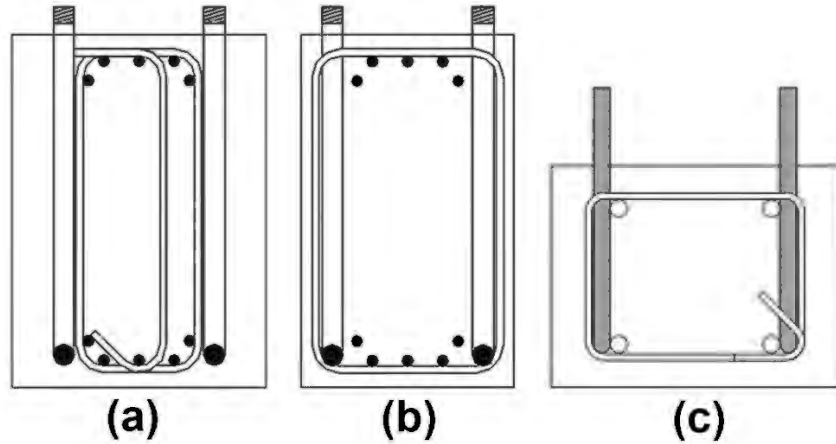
Confining reinforcement layouts in specimens with hooked bars placed outside the column core: (a) hooks outside the confining ties (Chun et al. 2017b), (b) hooks inside confining ties (Chun et al. 2017b), and (c) hooks inside confining ties (Sperry et al. 2015b)
